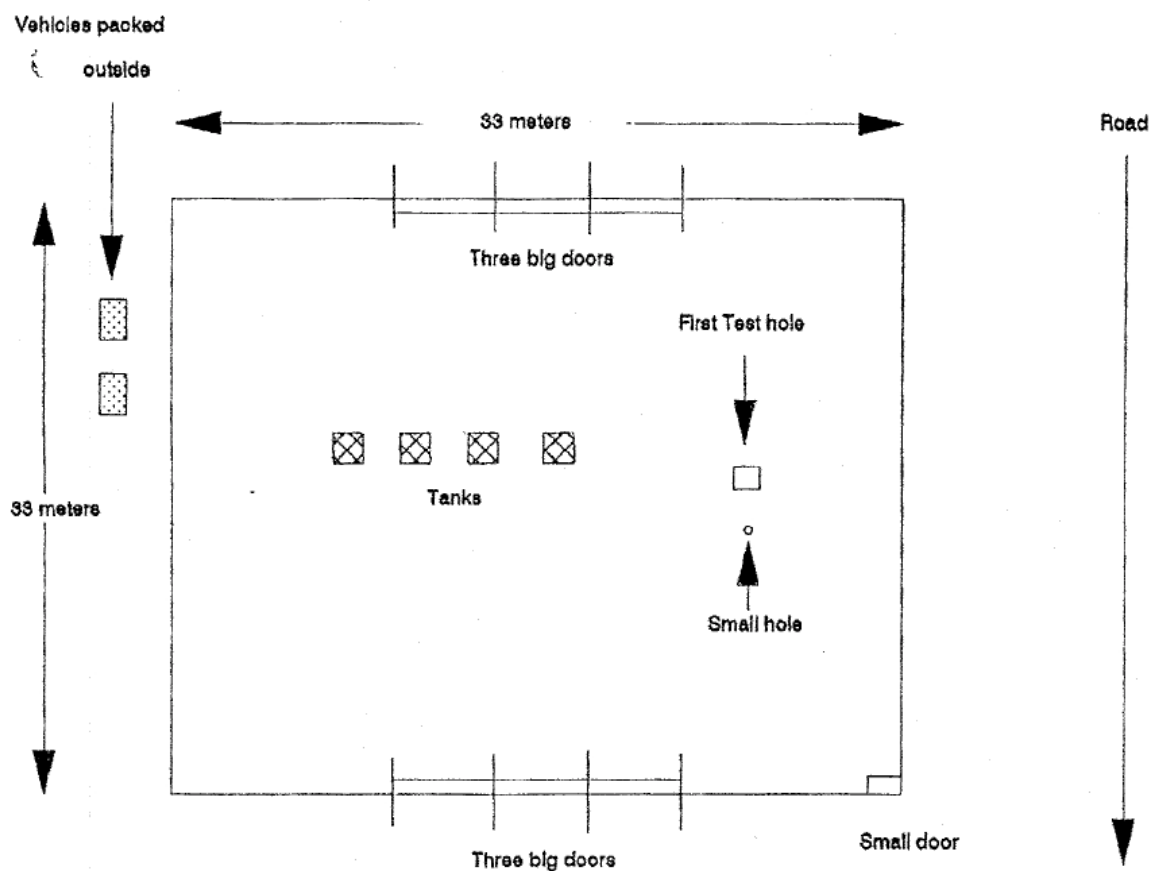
IAEA schematic of the plan of the shade. The three big doors match the three doors seen on one side of the building in Figure 4. The geographic orientation of the building is not provided.
